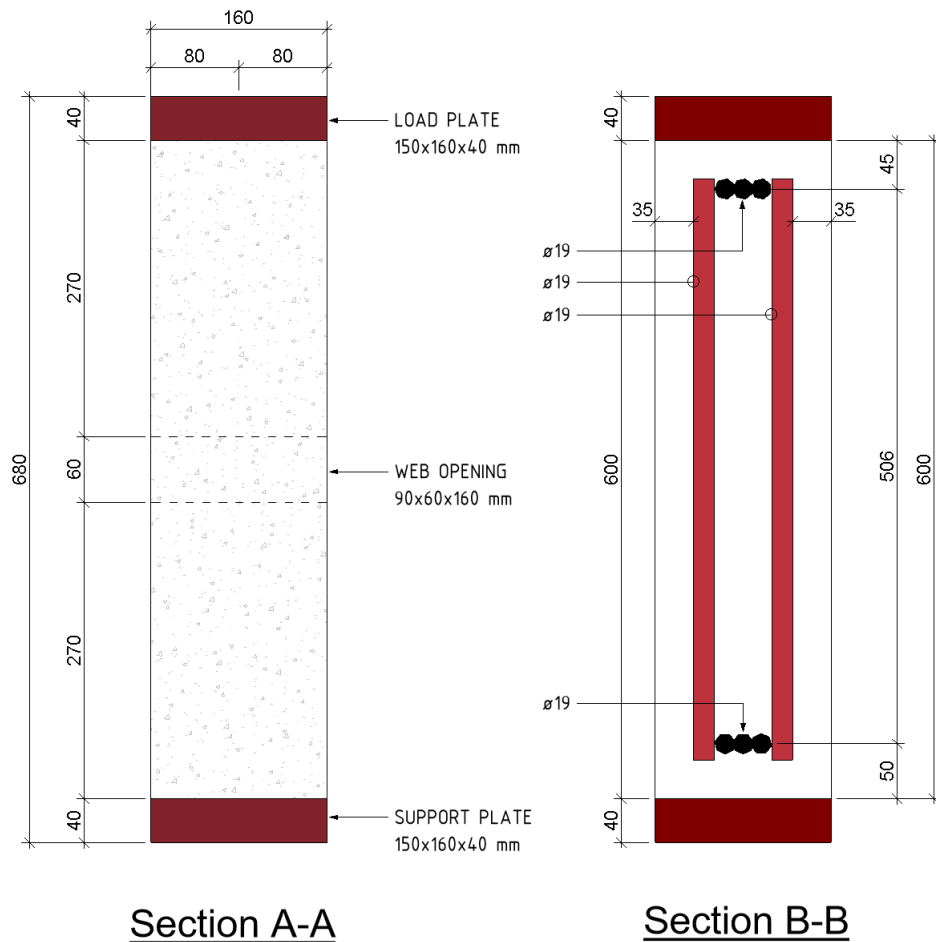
6IT1. Rebar- and concrete cross section. Dimensions in mm. Modelling tool [Autodesk Inc., 2018].
